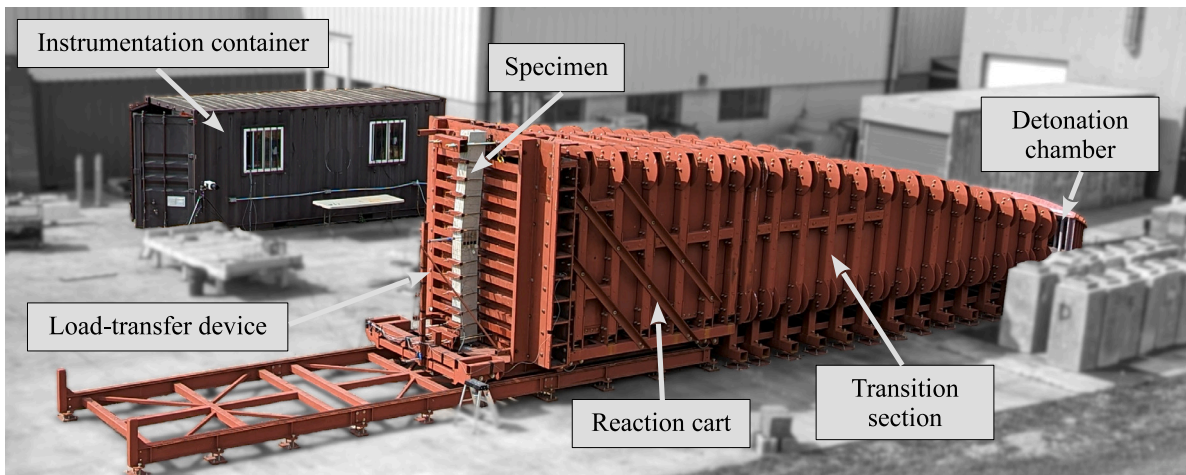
Photograph of a test specimen mounted to the shock tube.
